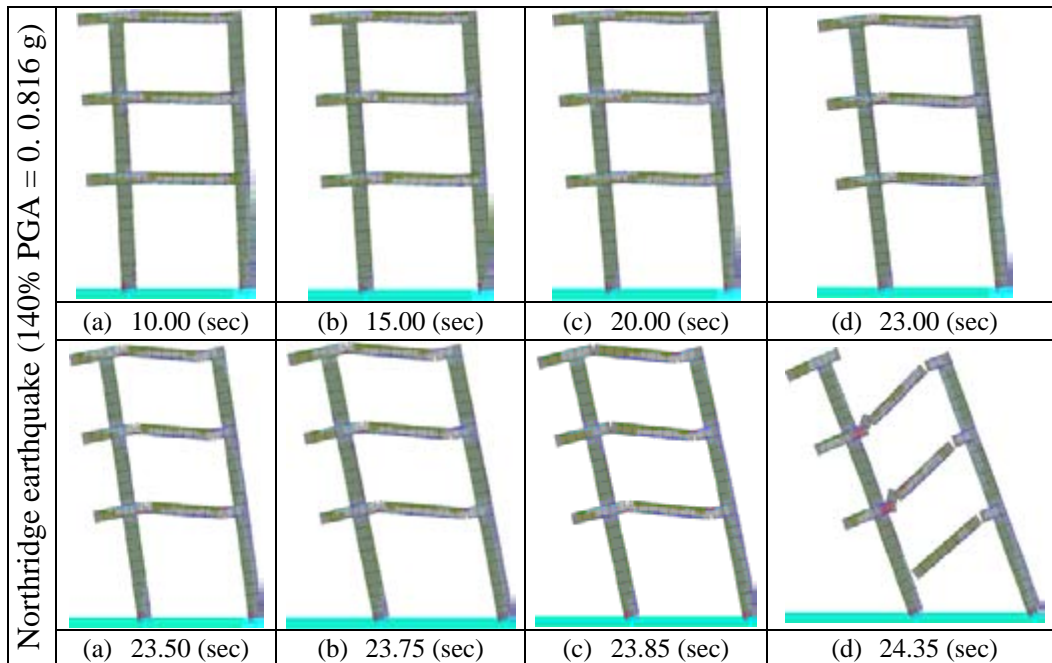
Collapse mechanism of building with RC jacketing in all floors
